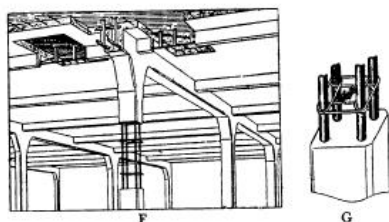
System of reinforced concrete, by Hennebique (from Whittick, *European Architecture 1*).
